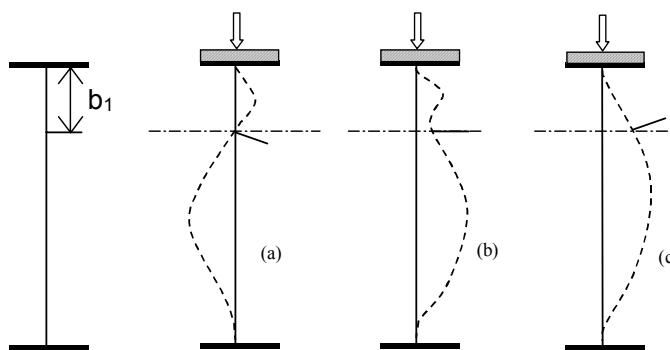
Buckling modes for girder with patch load on a longitudinally stiffened web
